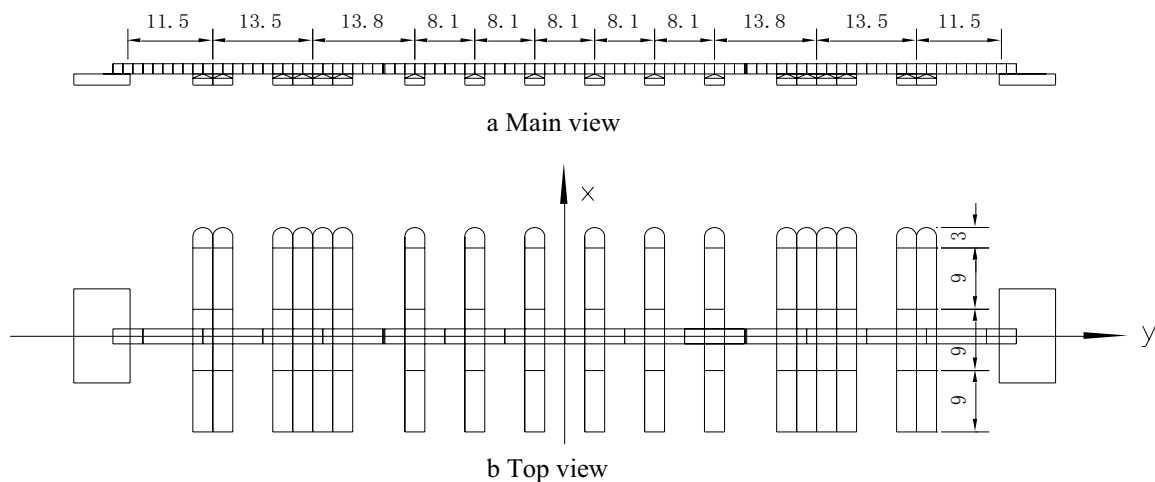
Layout schematic of the 67-type railway bridge (Unit: m)
